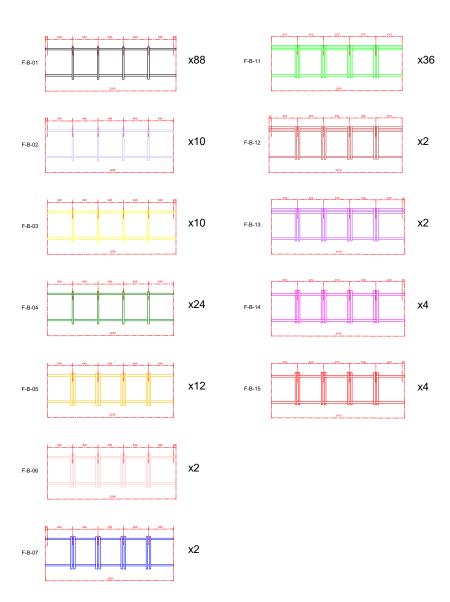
Roof trusses, Working drawing. Drawn by Studio Tom Emerson.
